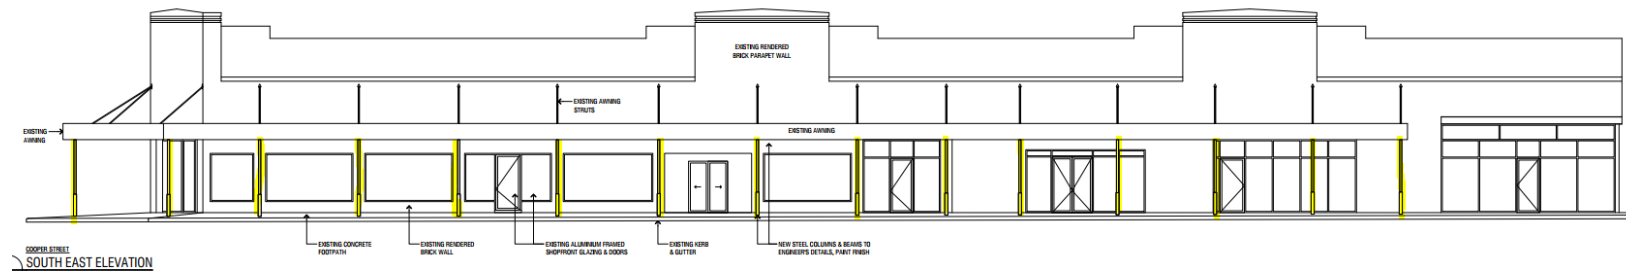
Wallendoon Street elevation (columns highlighted yellow for ease of viewing)
